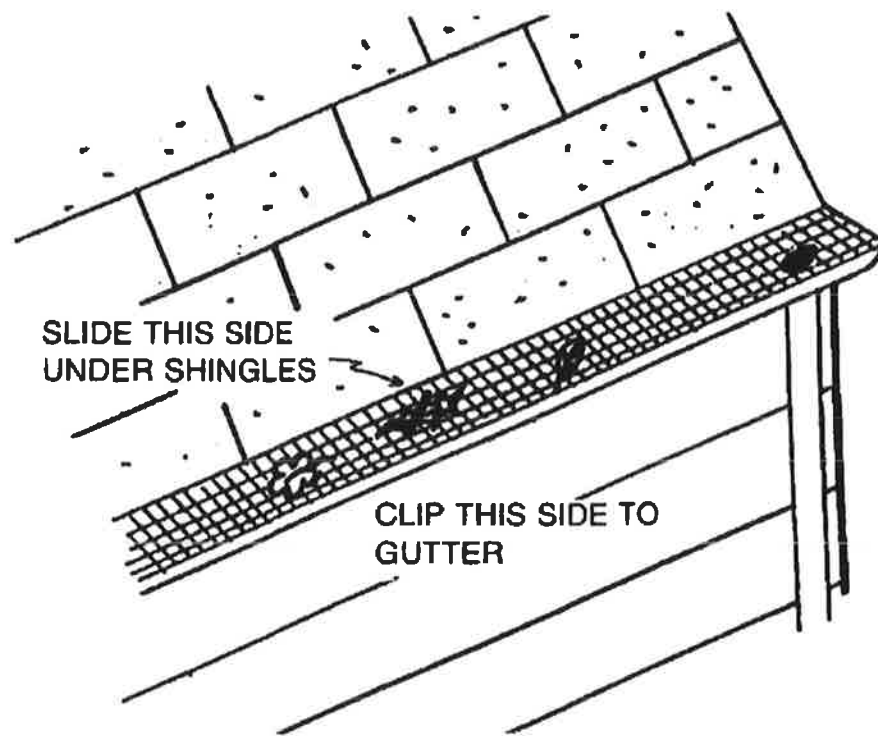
Gutter guard. (Source: Midwest Plan Service, Iowa State Univ. 1968. Private Water Systems p. 14)
